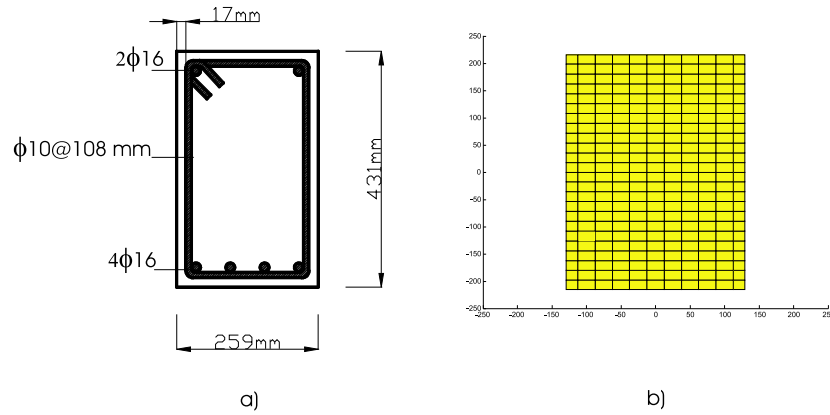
Studied section. a) dimensions and details, b) finite element mesh.
